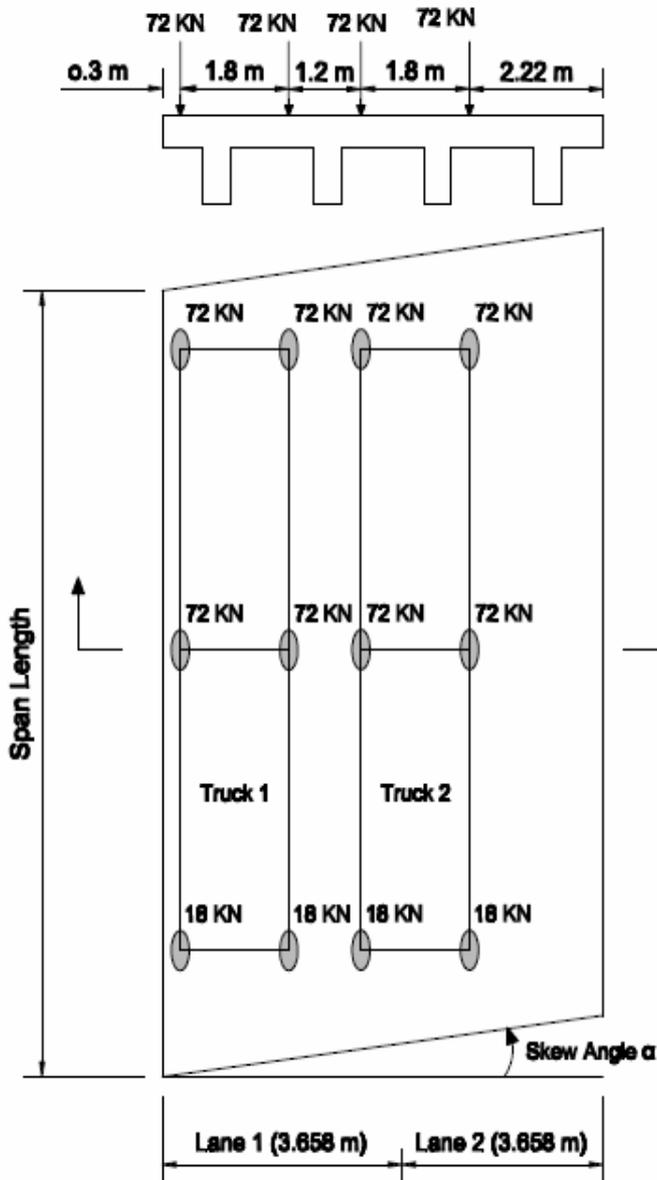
Typical two-lane skewed bridge with edge truck loading
